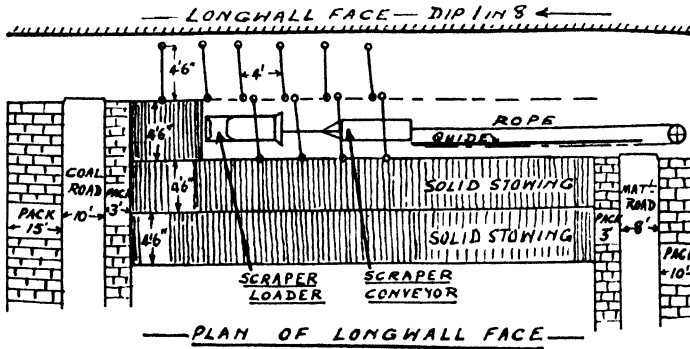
Details of Longwall Face with Scraper Loader for Stowing.
